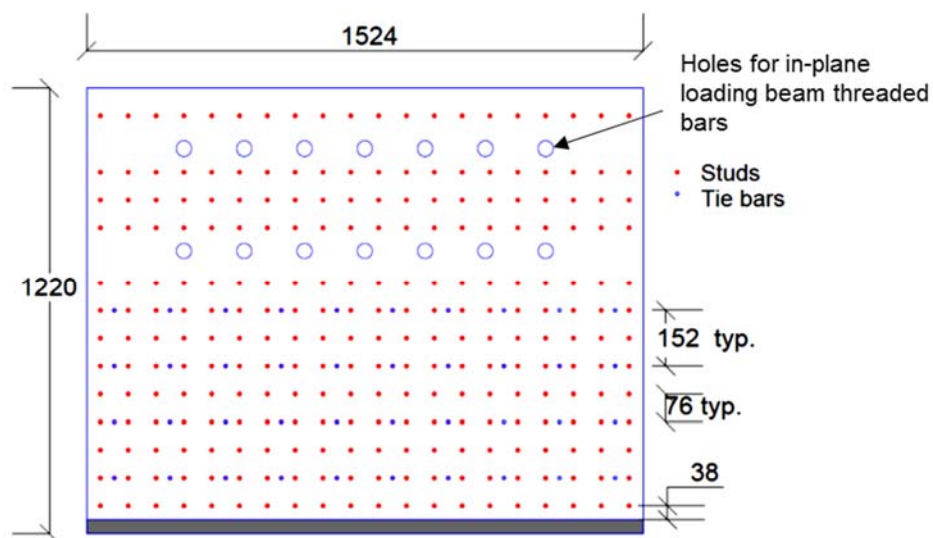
SC-WP-H: Stud and tie layout details (in mm units)
